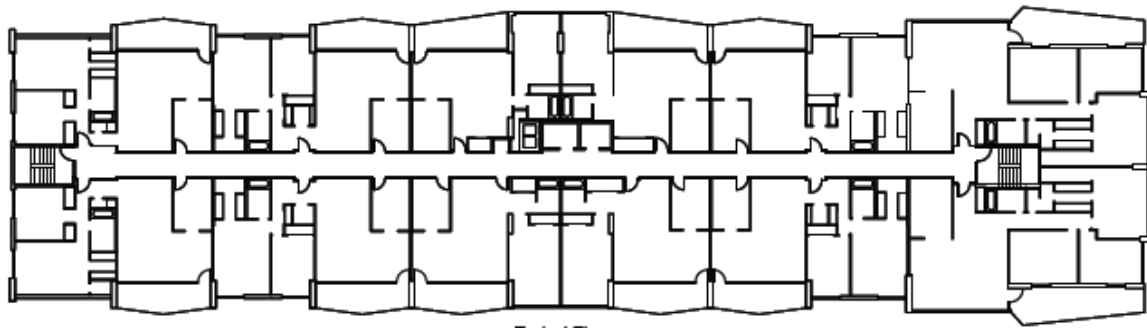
A typical floor plan of the archetype tower (Kesik & Saleff, 2009)
